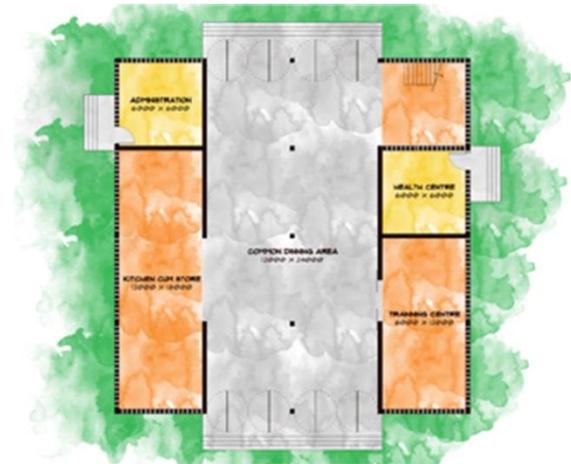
Floor Plan of Common Dining and Workshop Facility. Source: Author
